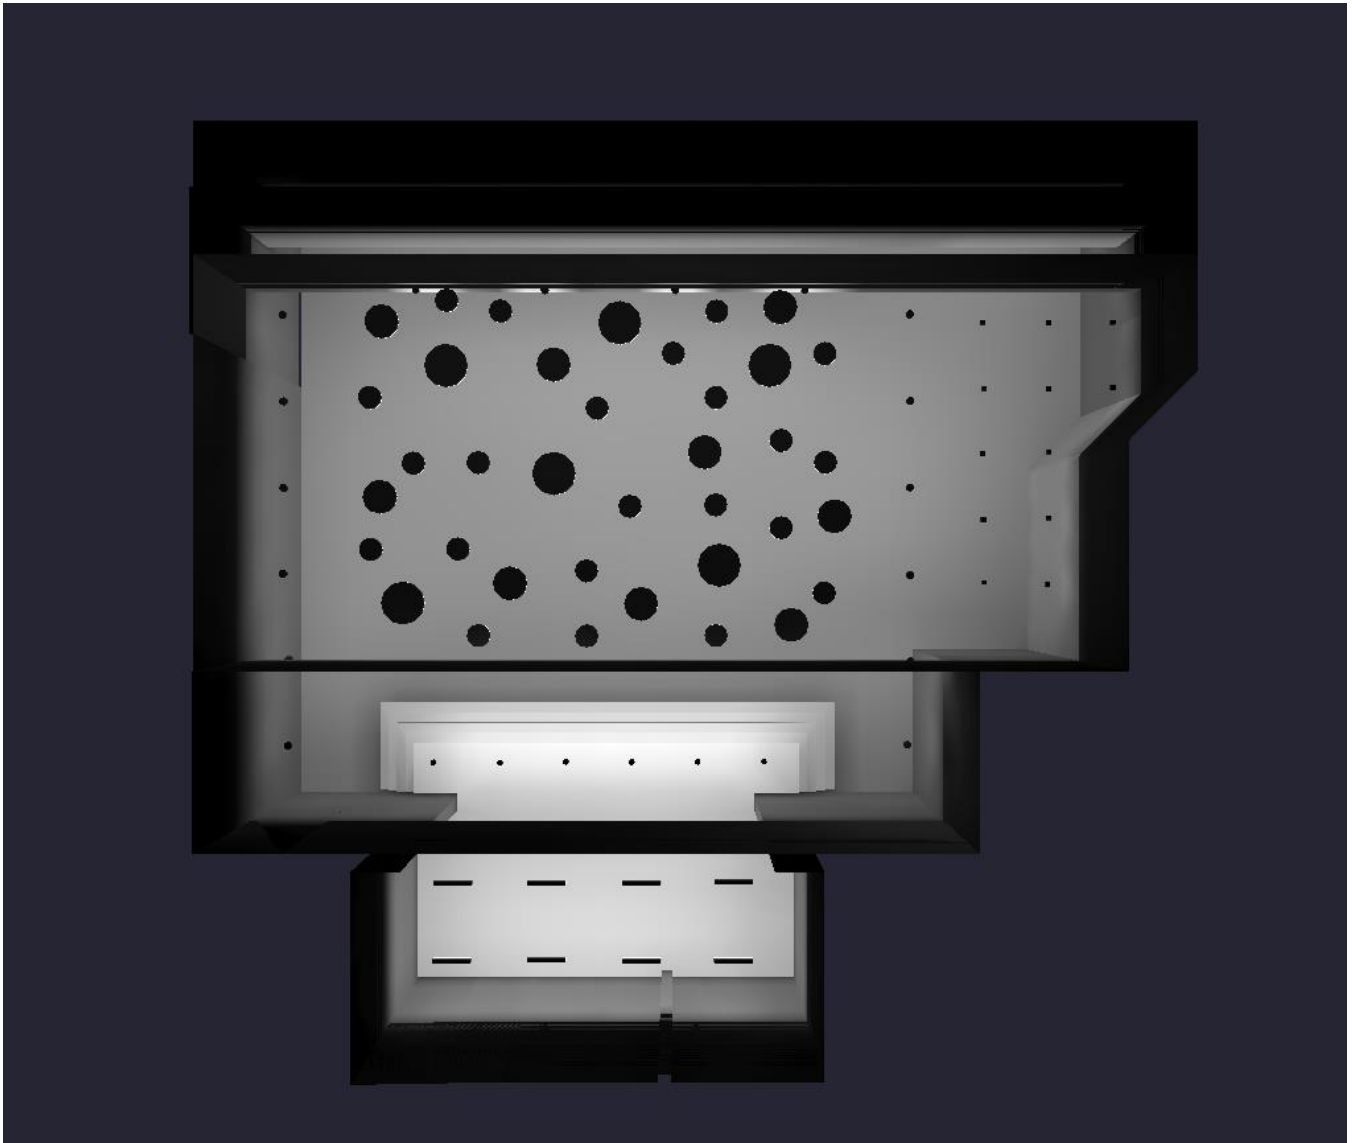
Ceiling Plan of Existing Lighting in AGi32
